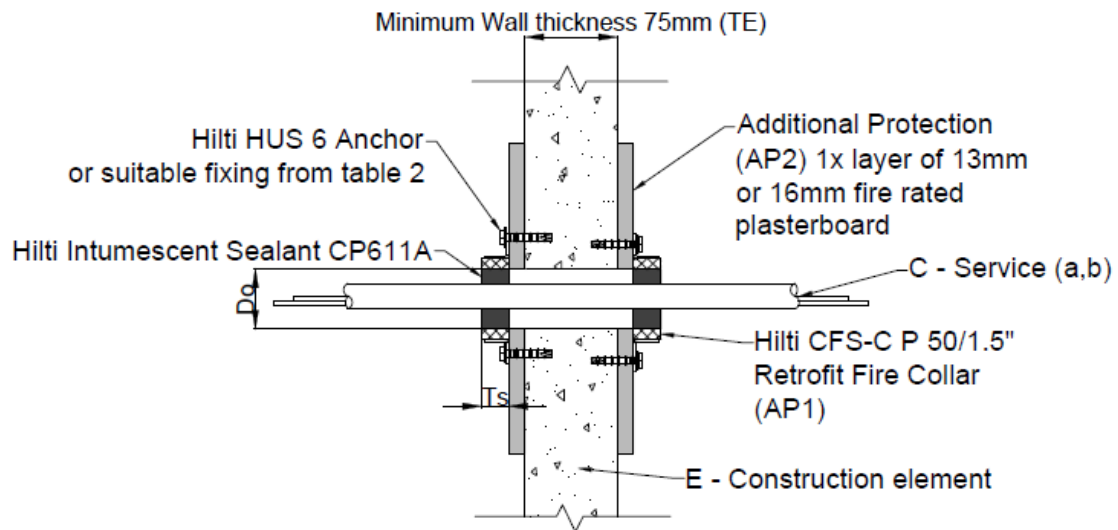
Side view, Seal Type 14, 75mm concrete wall, uPVC Conduits $\leq 40\text{mm}$ OD, CP611a + AP1 refer to table 17
